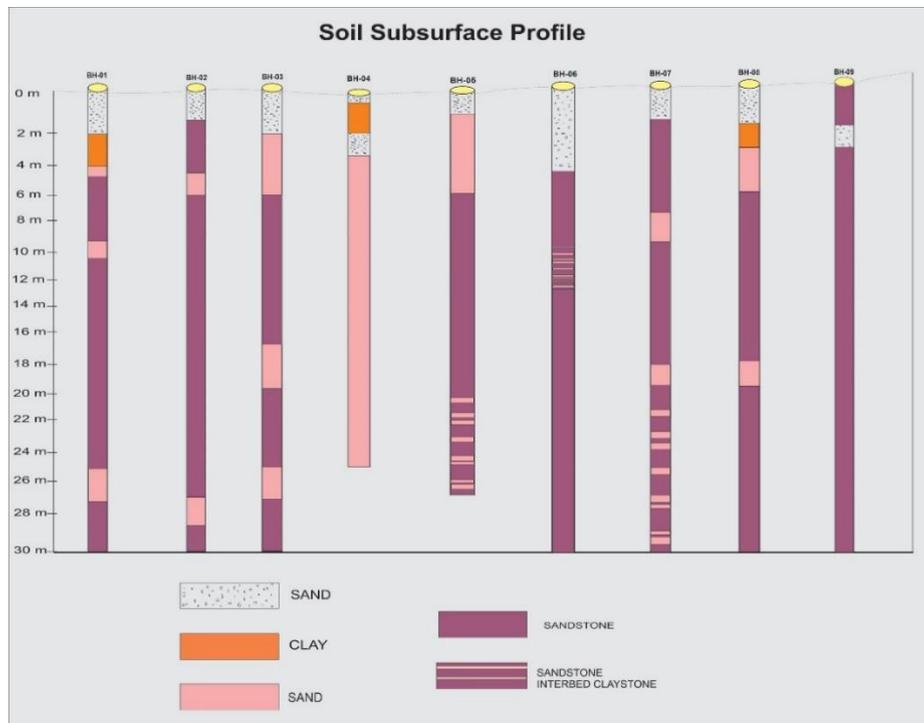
Subsurface soil profile, Pak Fazaia, Sector-A, Zone-11, Karachi, Pakistan.
